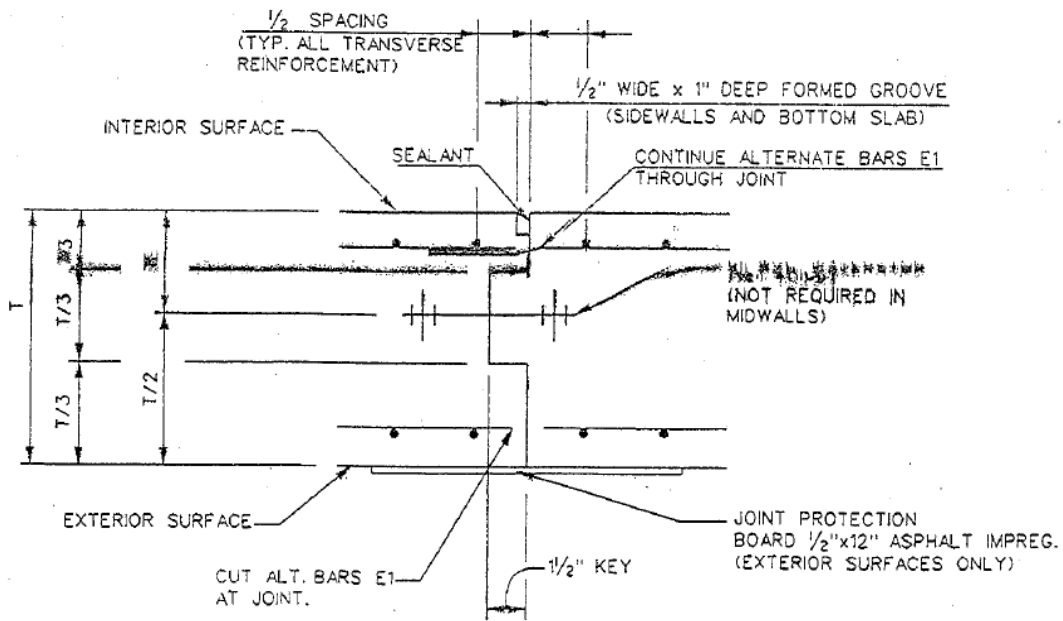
Transverse Contraction Joint used in Corridor X Culvert at 4959+43 (ALDOT 2000b)
